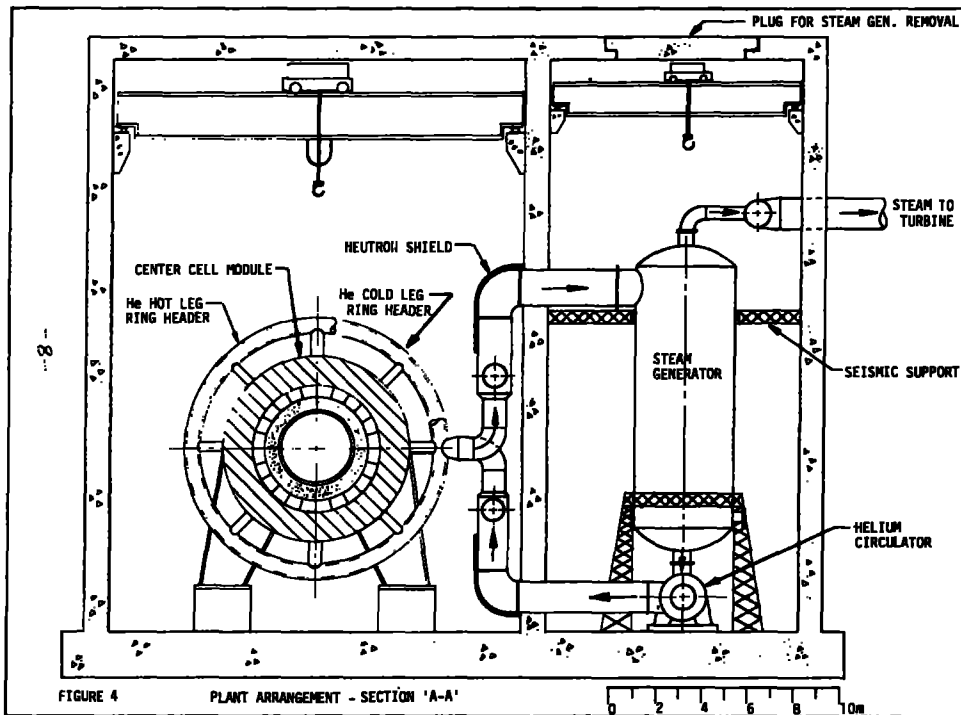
Heat transport system, showing piping and equipment arrangement (sideview).
